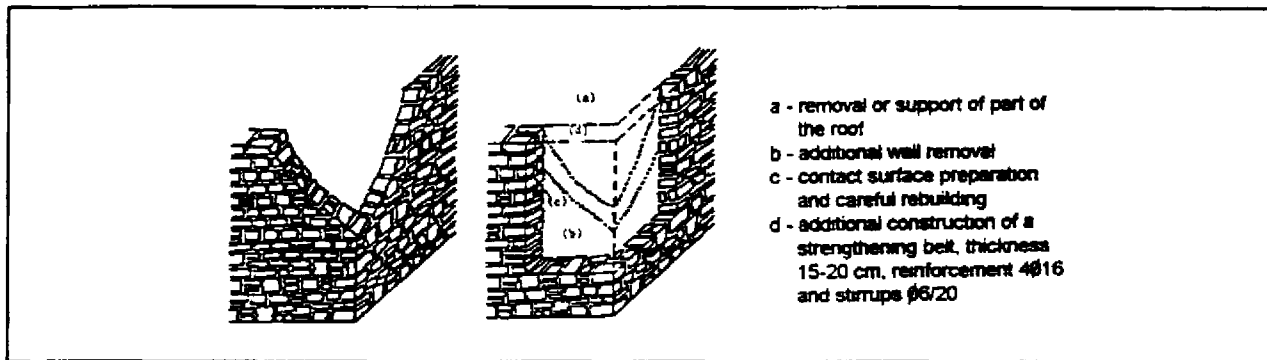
Repairing Collapsed Corners in Stone Masonry. [3]
